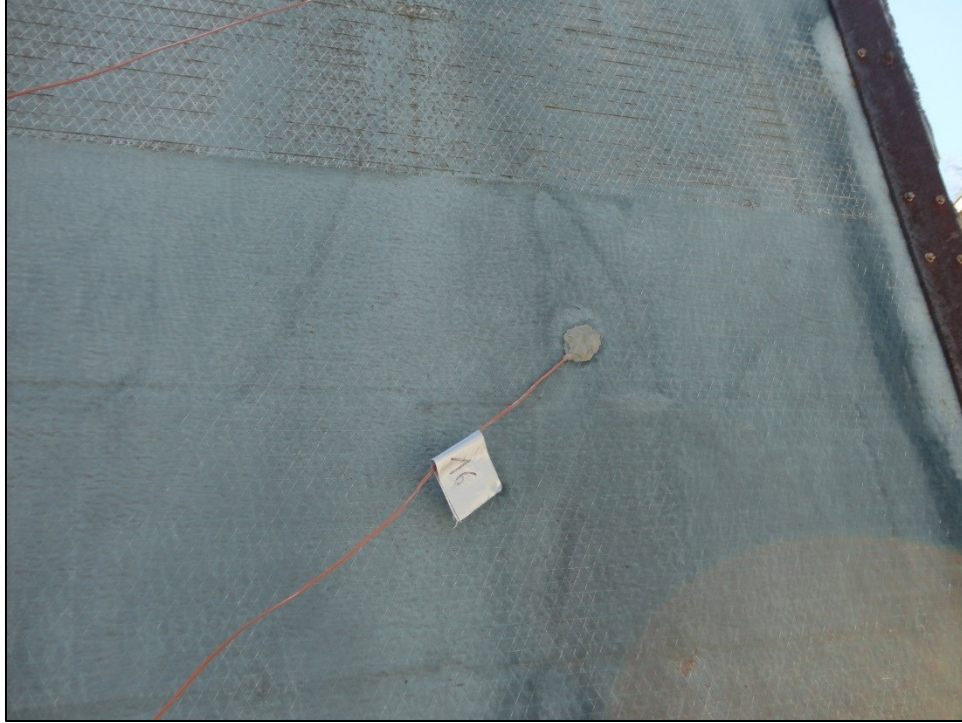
Thermal Image Location 16 1:54 PM (North Side of Wall 2)
